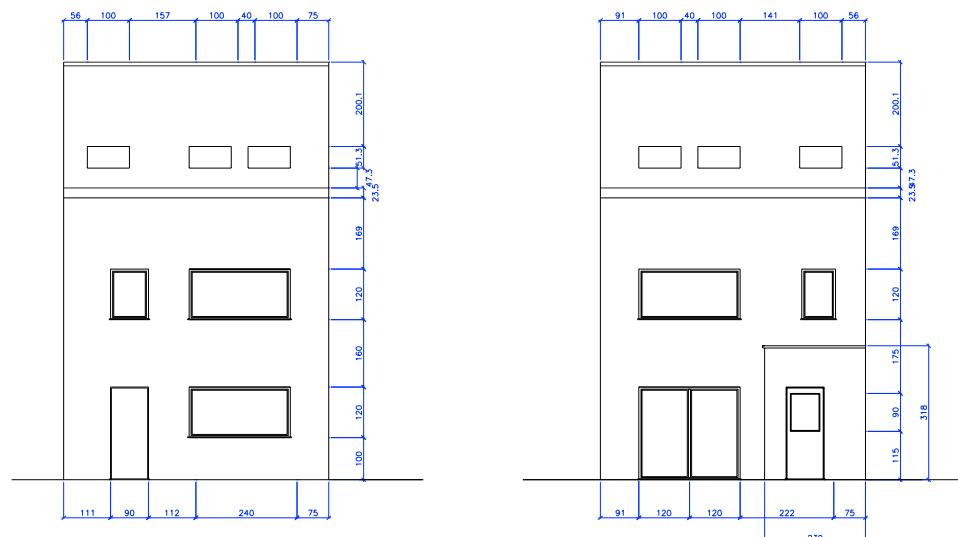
Terraced house: North elevation (left) and South elevation (right)
